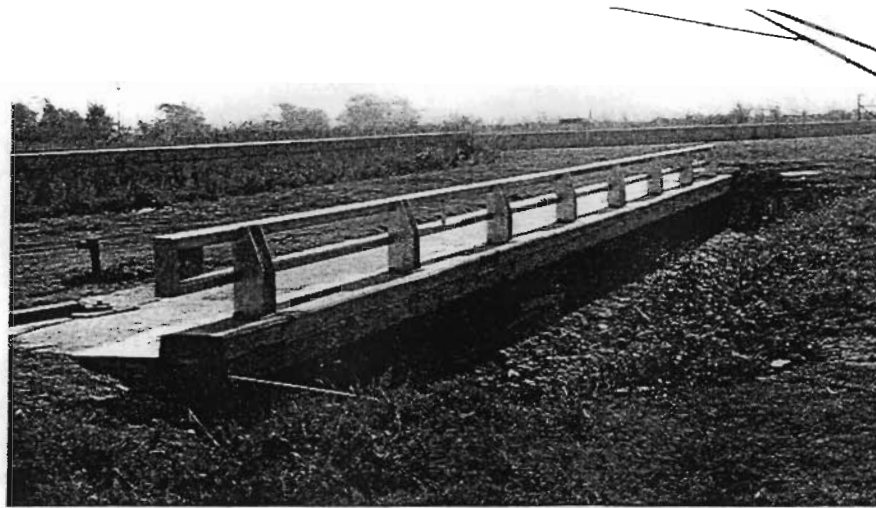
Wyoming TL-4 bridge railing test installation before test 472610-3.
